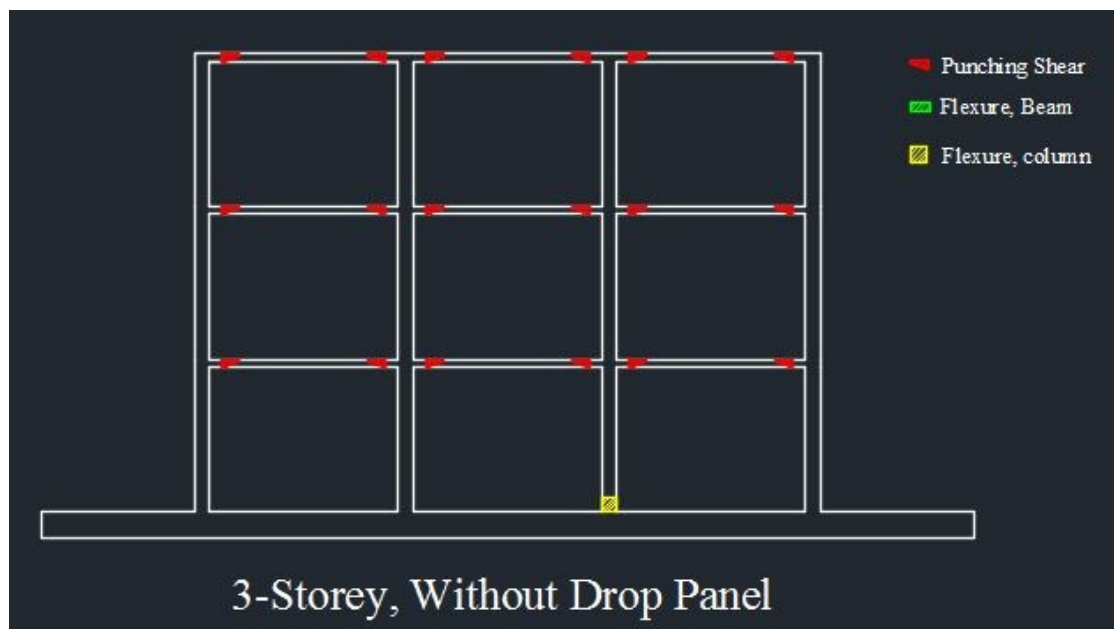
4 : Hinge Formation for 3-Storey Model Building at Collapse Load (Without Drop Panel)
